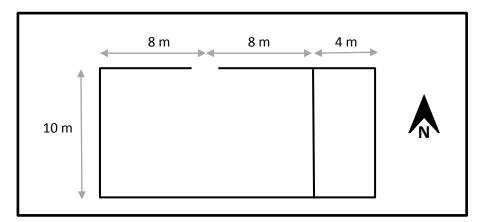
Floor plan of the historical kraal in the south-eastern corner of Palmietfontein (point 140).
